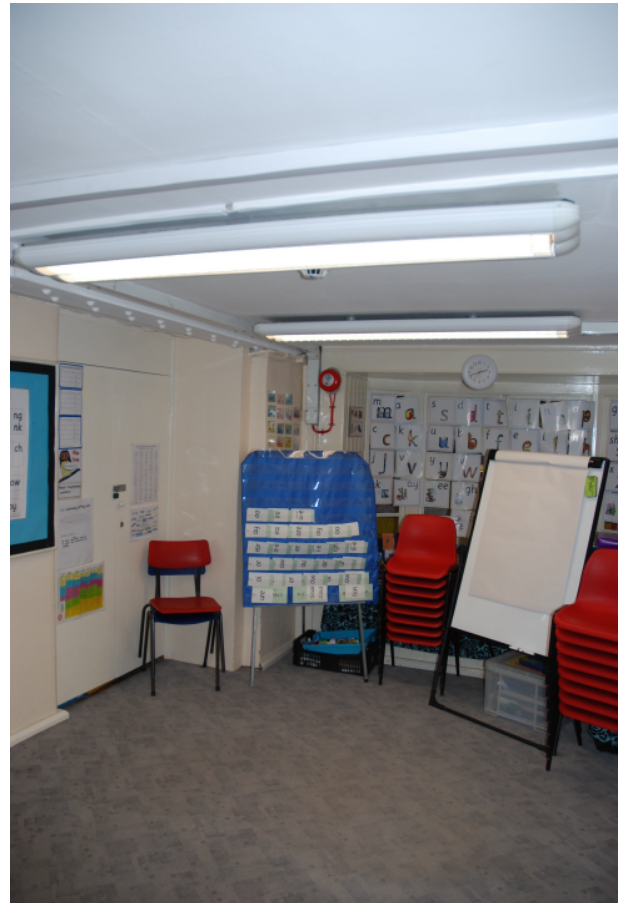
Mezzanine level 1A, looking south-east, showing the area of the proposed new lobby
